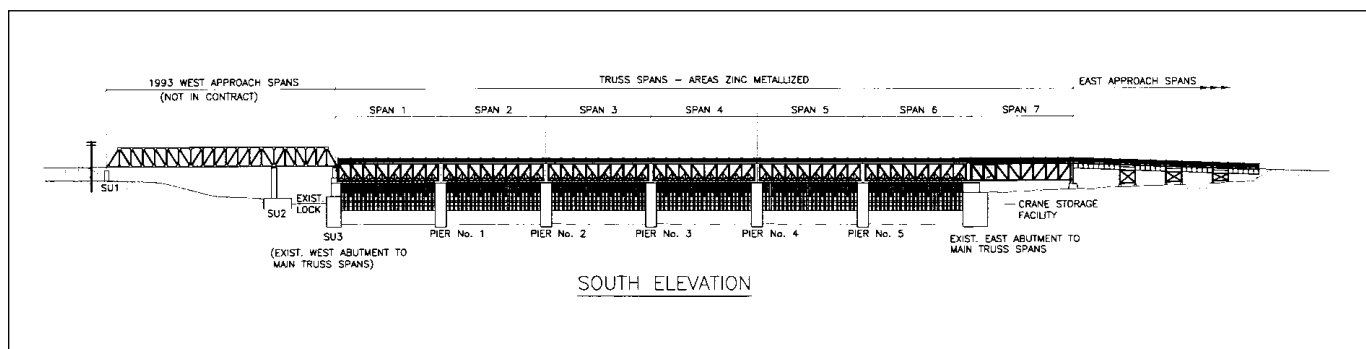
Schematic shows metallizing project on St. Andrews Lock and Dam in relation to whole structure. Courtesy of PWGSC and Wardrop Engineering
